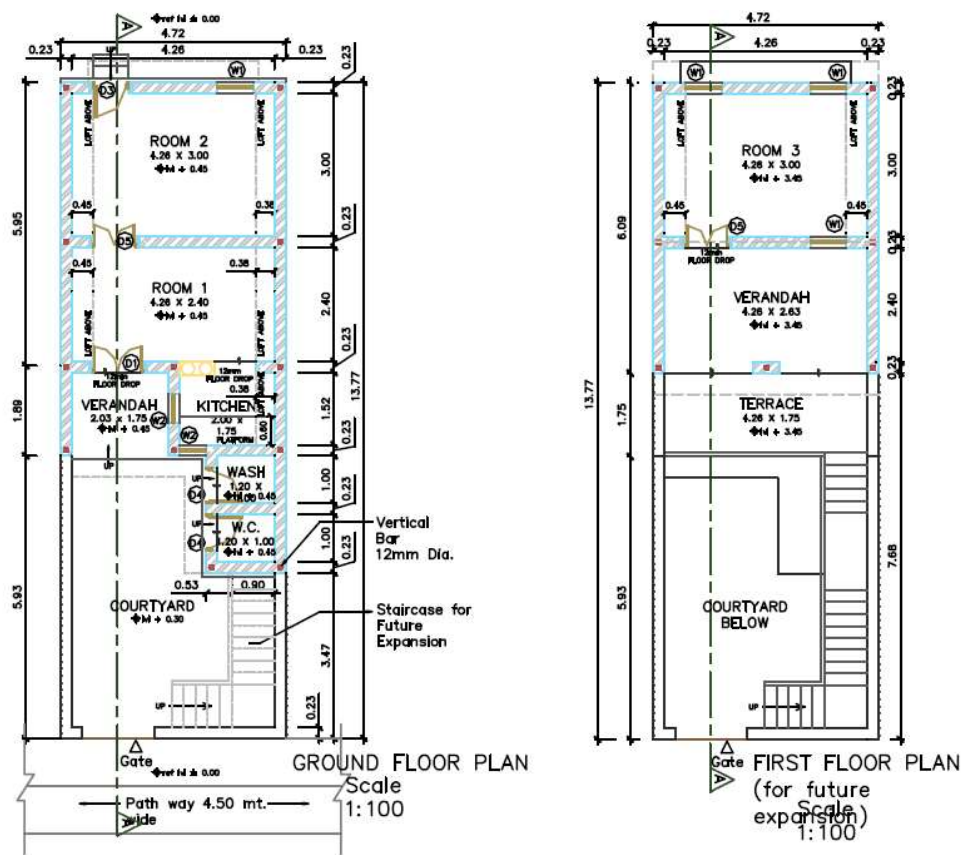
Early Architectural Plans for Two-Story Homes. Note that the 'First Floor Verandah' was enclosed to create 'Room 4' when constructed; (Courtesy Hunnarshala)
